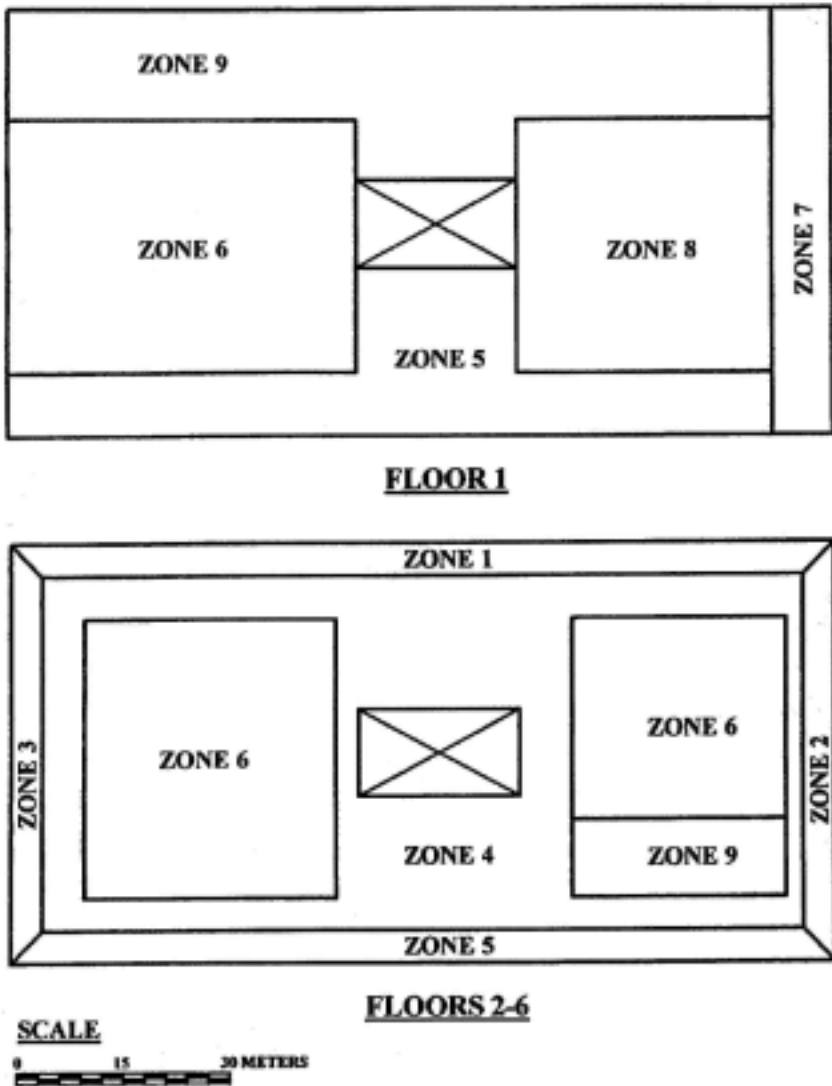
Typical Floor Plans for Floors 1 and 2 through 6 for Hospital Building
